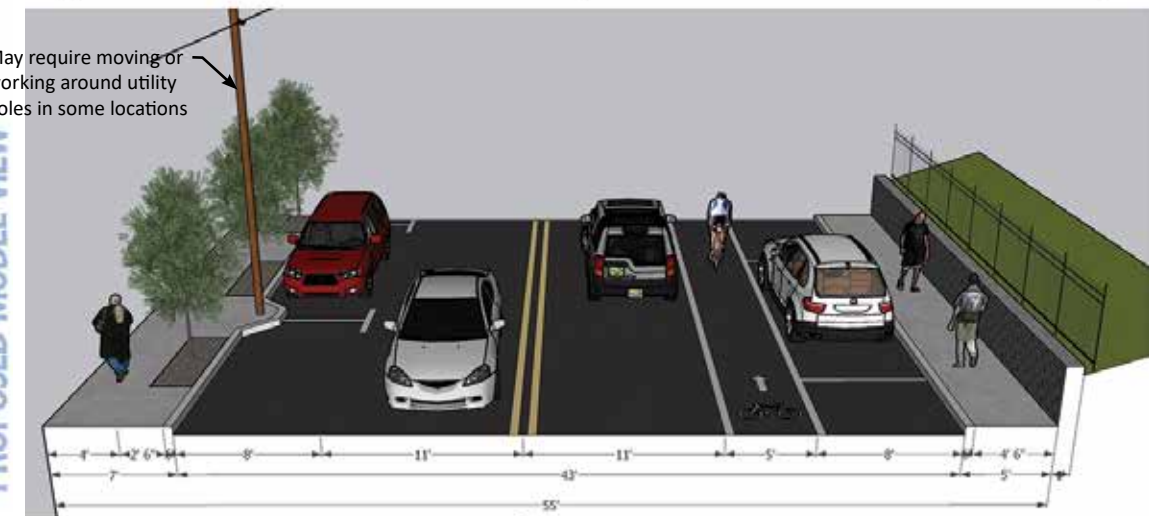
Albany Street : Georgetta Dix Plaza to Germania Avenue Design Concept Cross-Section
